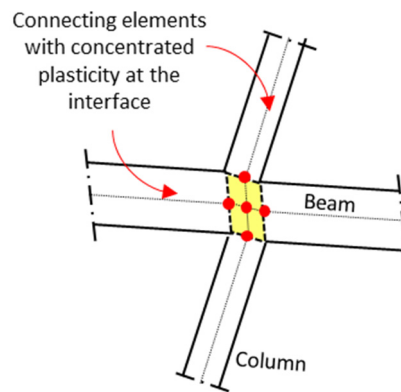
Simulation of Beam column joint modelling (Khan, Basit and Ahmad, 2021).
